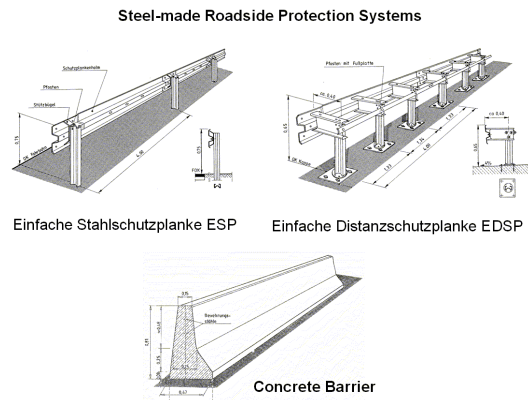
Two steel-guard rails and a concrete barrier common for German roads and investigated with full-scale crash tests
